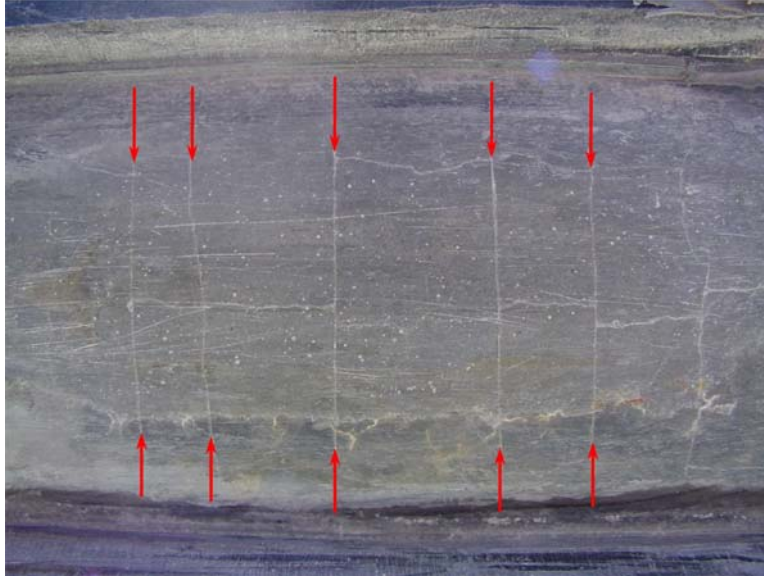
Longitudinal Cracks in Grout, Corrosion of Strand, and Wire Breaks near Midspan of Specimen 1
